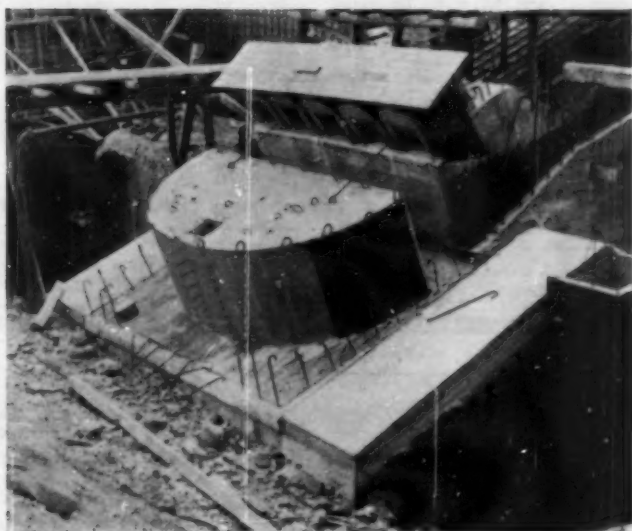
Anchor Blocks at Bridge at Stuttgart.
